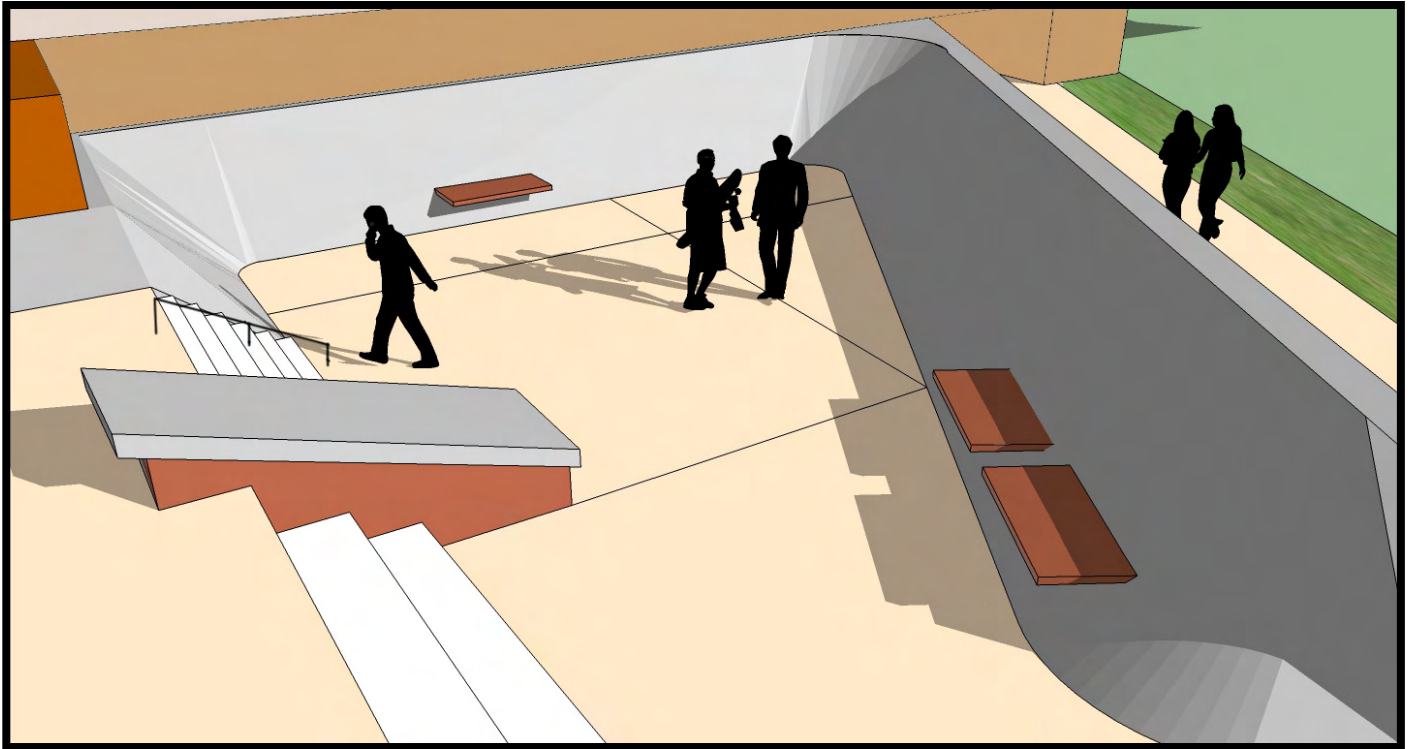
View D-- Banked Wall Resembling Bowl/Half-pipe
